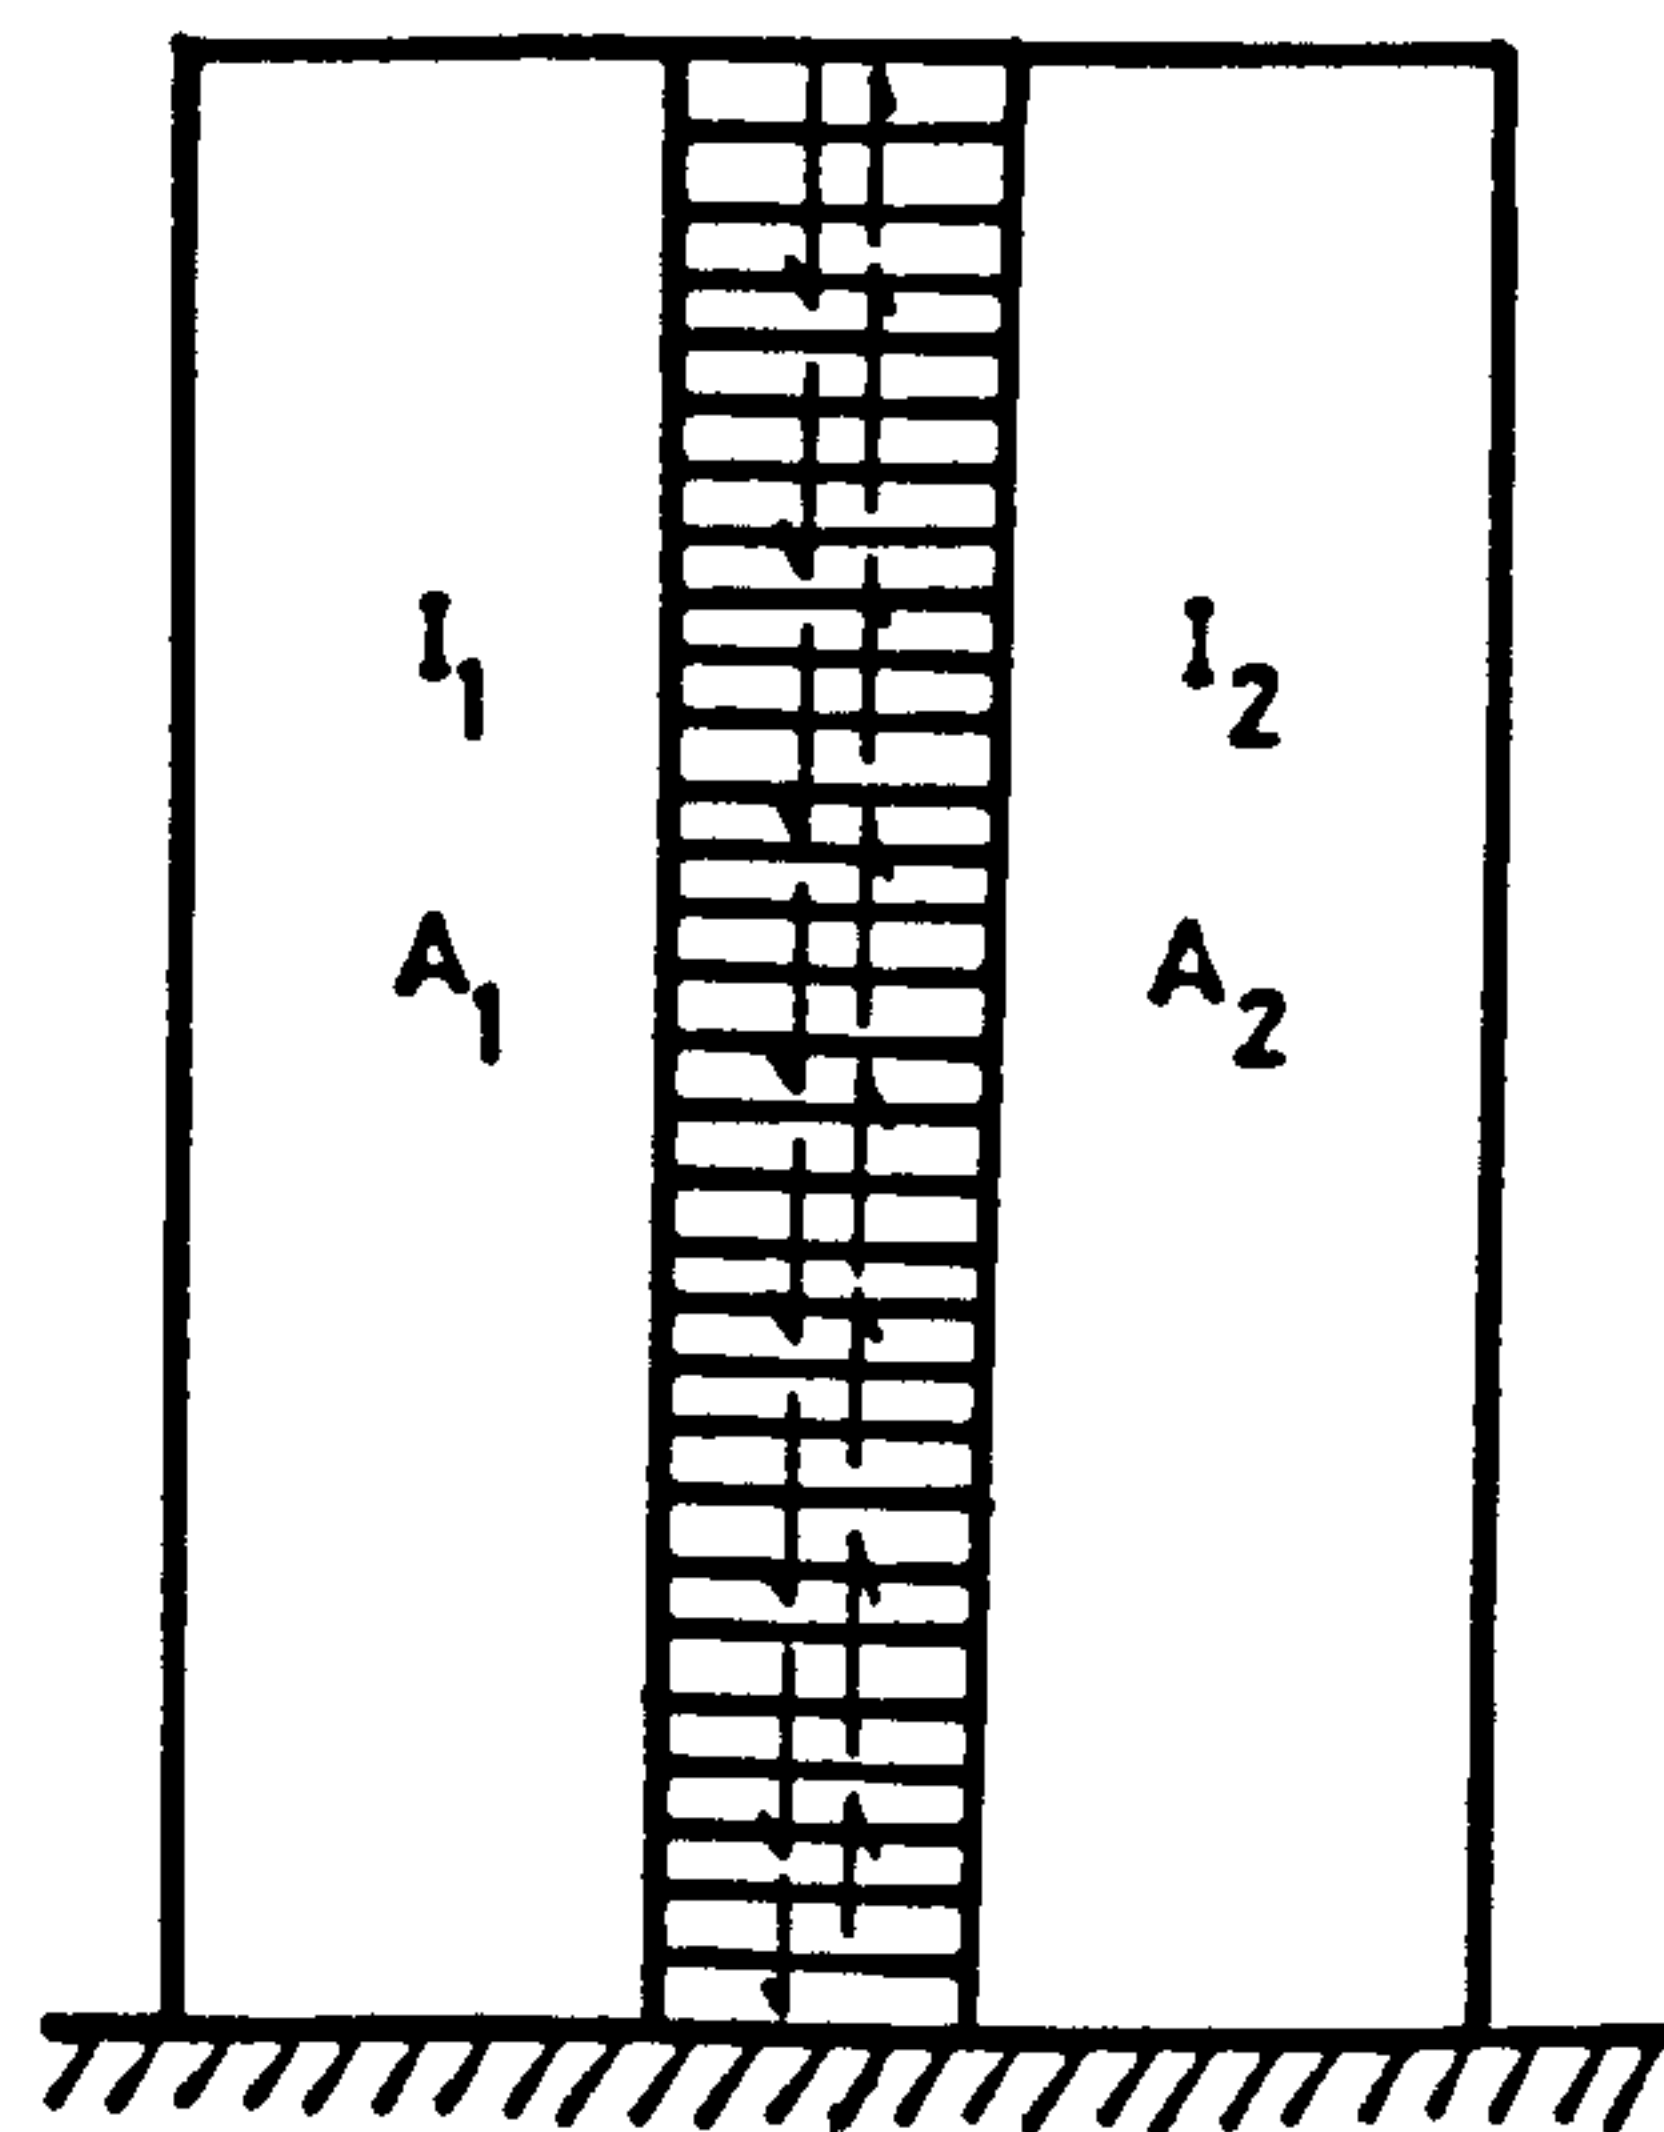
Shear wall with idealized continuous connection or laminae.
